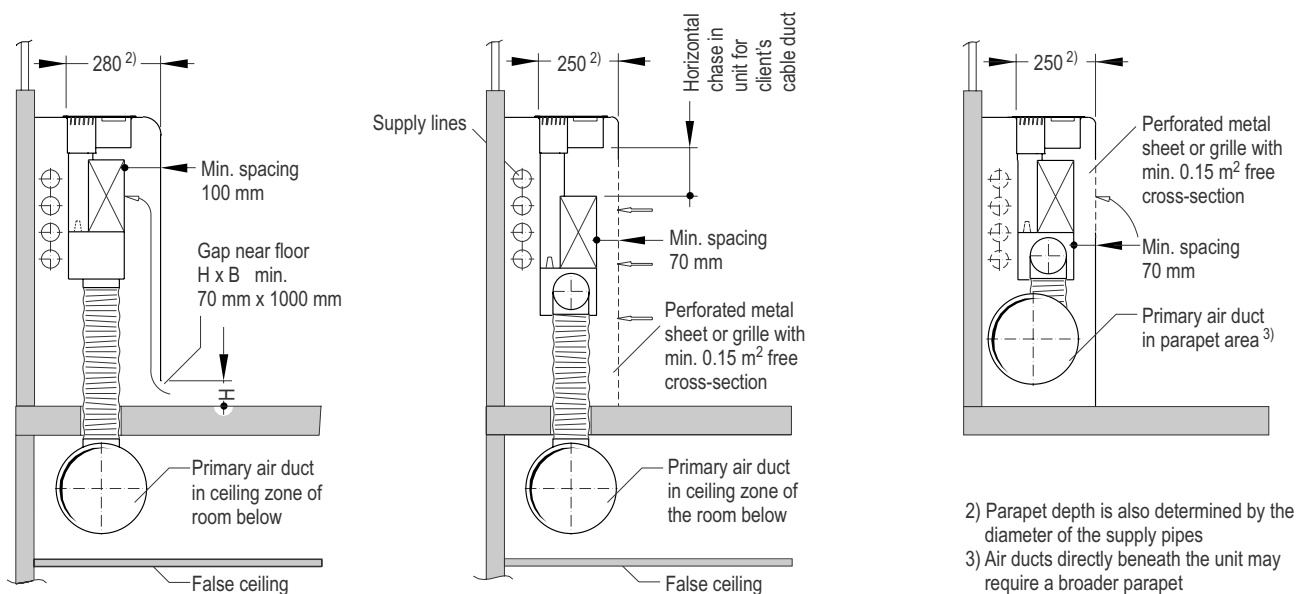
Examples of exhaust air openings in the building-side parapet covering, as:
